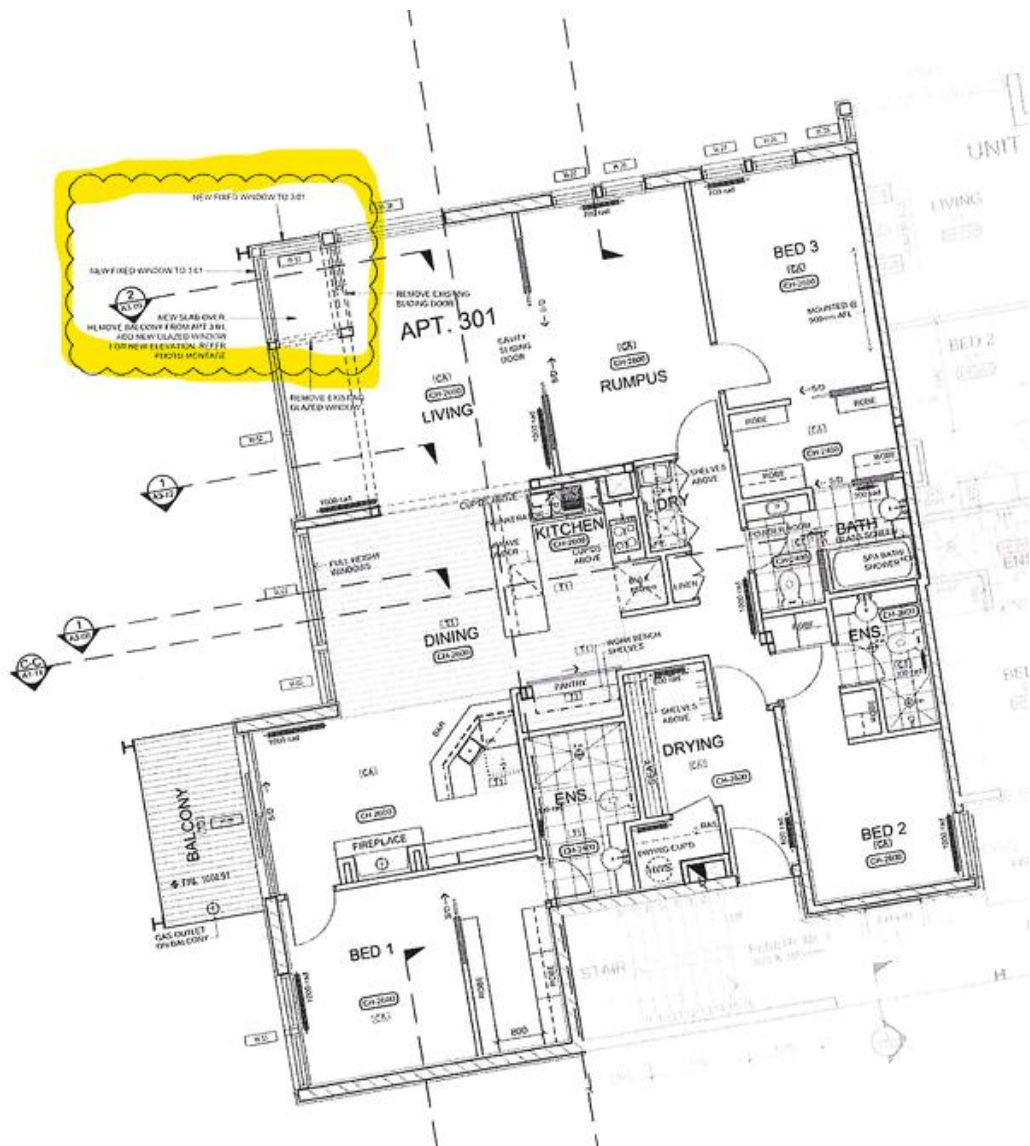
Proposed changes to floor plan of Apartment 2.02 outlined in yellow (Source: Application and modified by DTP)
